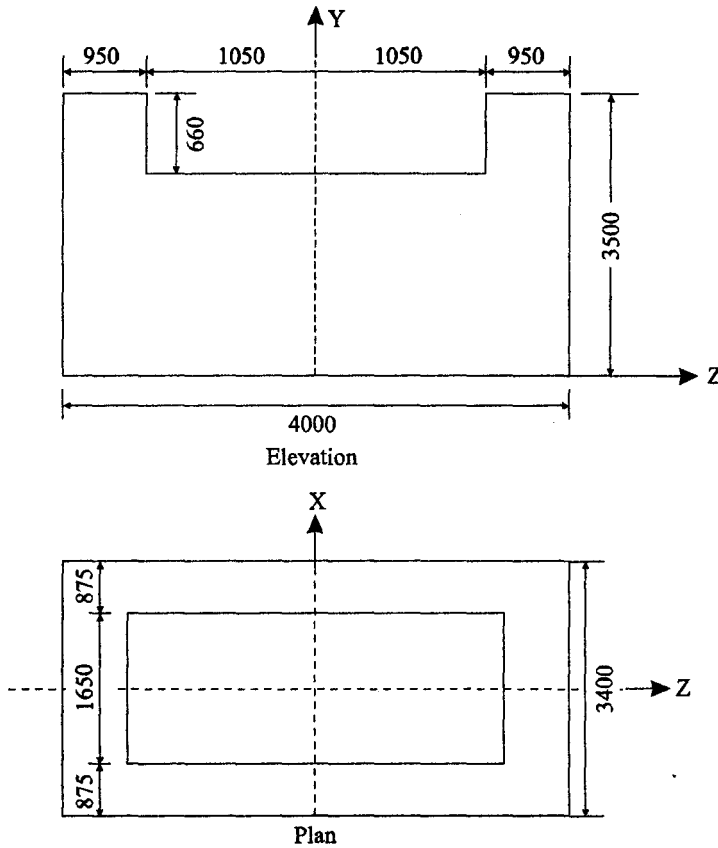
Foundation Plan & Elevation for 1.1 t Drop Hammer
